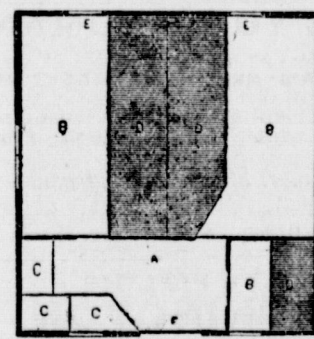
GROUND PLAN FOR DOUBLE POULTRY HOUSE.
